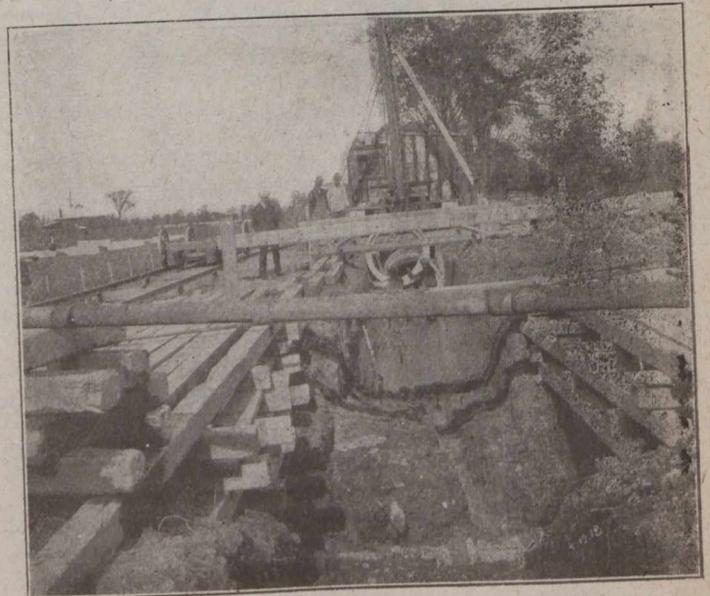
LAYING 48-IN. CONCRETE PIPE—NOTE CONVEYOR ON TRACK AT LEFT
